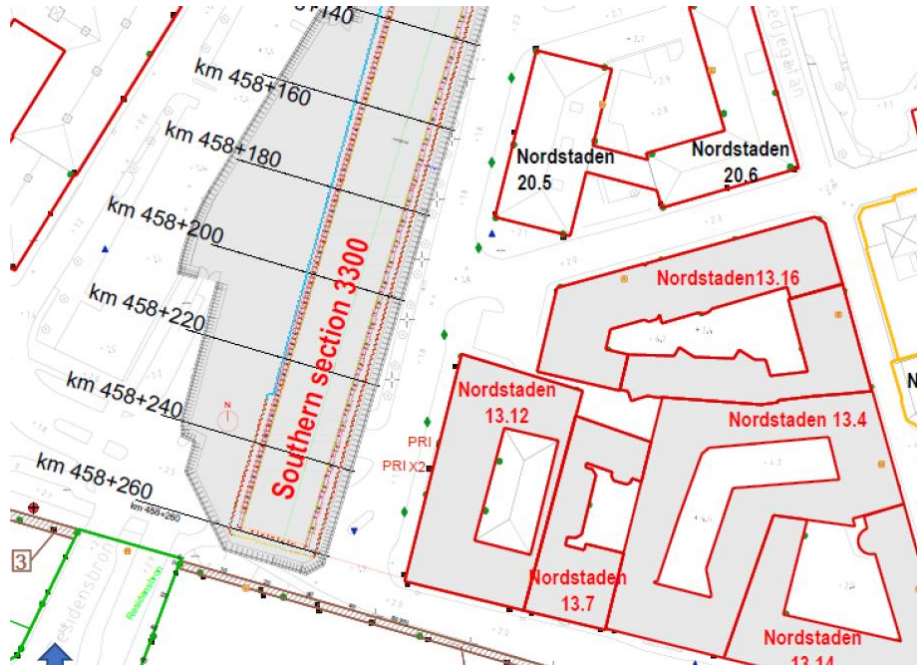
Project location and plan view of Kvarnberget Southern section (tunnel alignment and nearby buildings).
